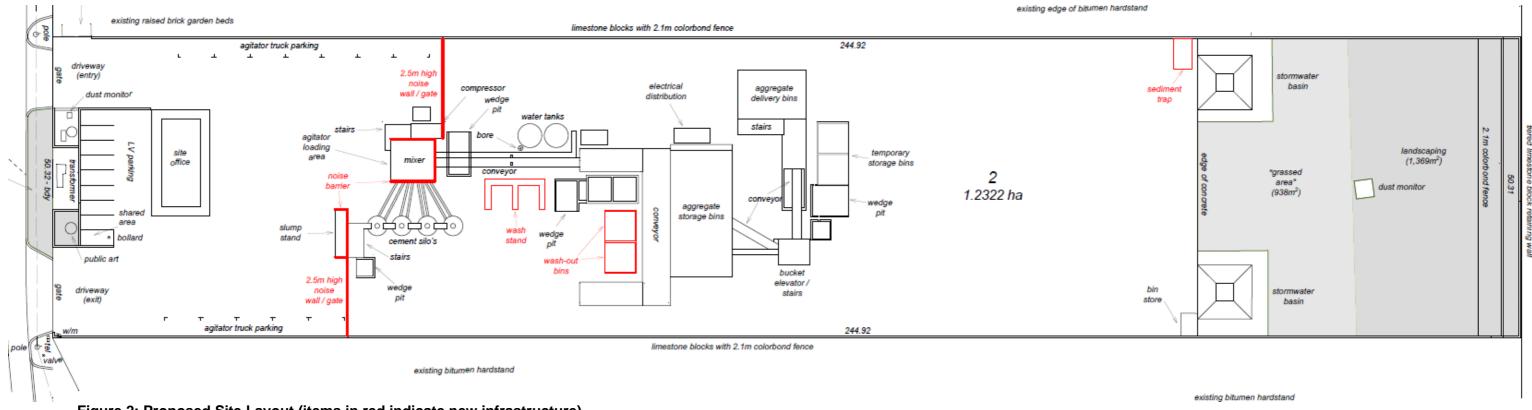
Proposed Site Layout (items in red indicate new infrastructure)
